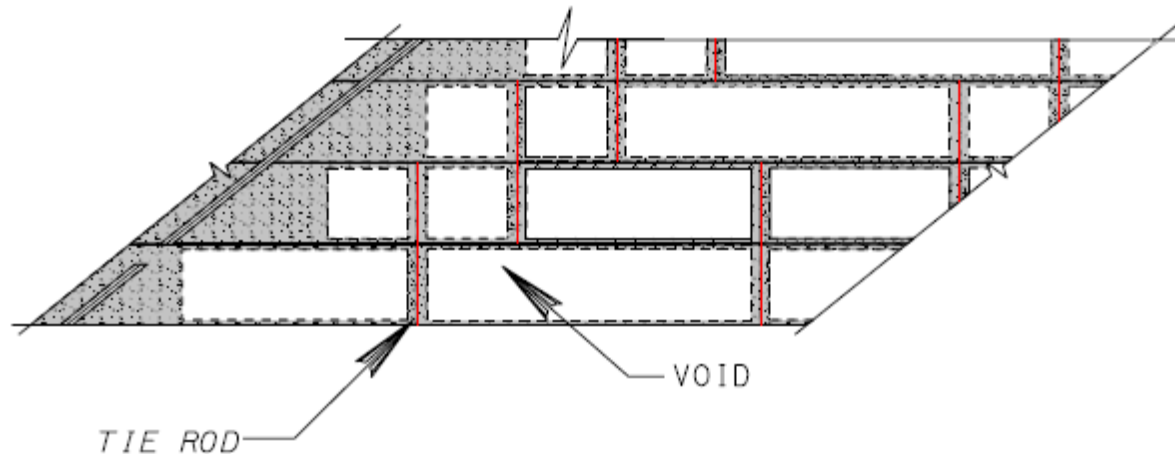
PennDOT 1st Generation Noncomposite Adjacent Prestressed Concrete Box Beam Bridge Staggered Tie Rod Arrangement
